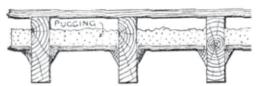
Section of Sound-proof Ploor with Pugging.
